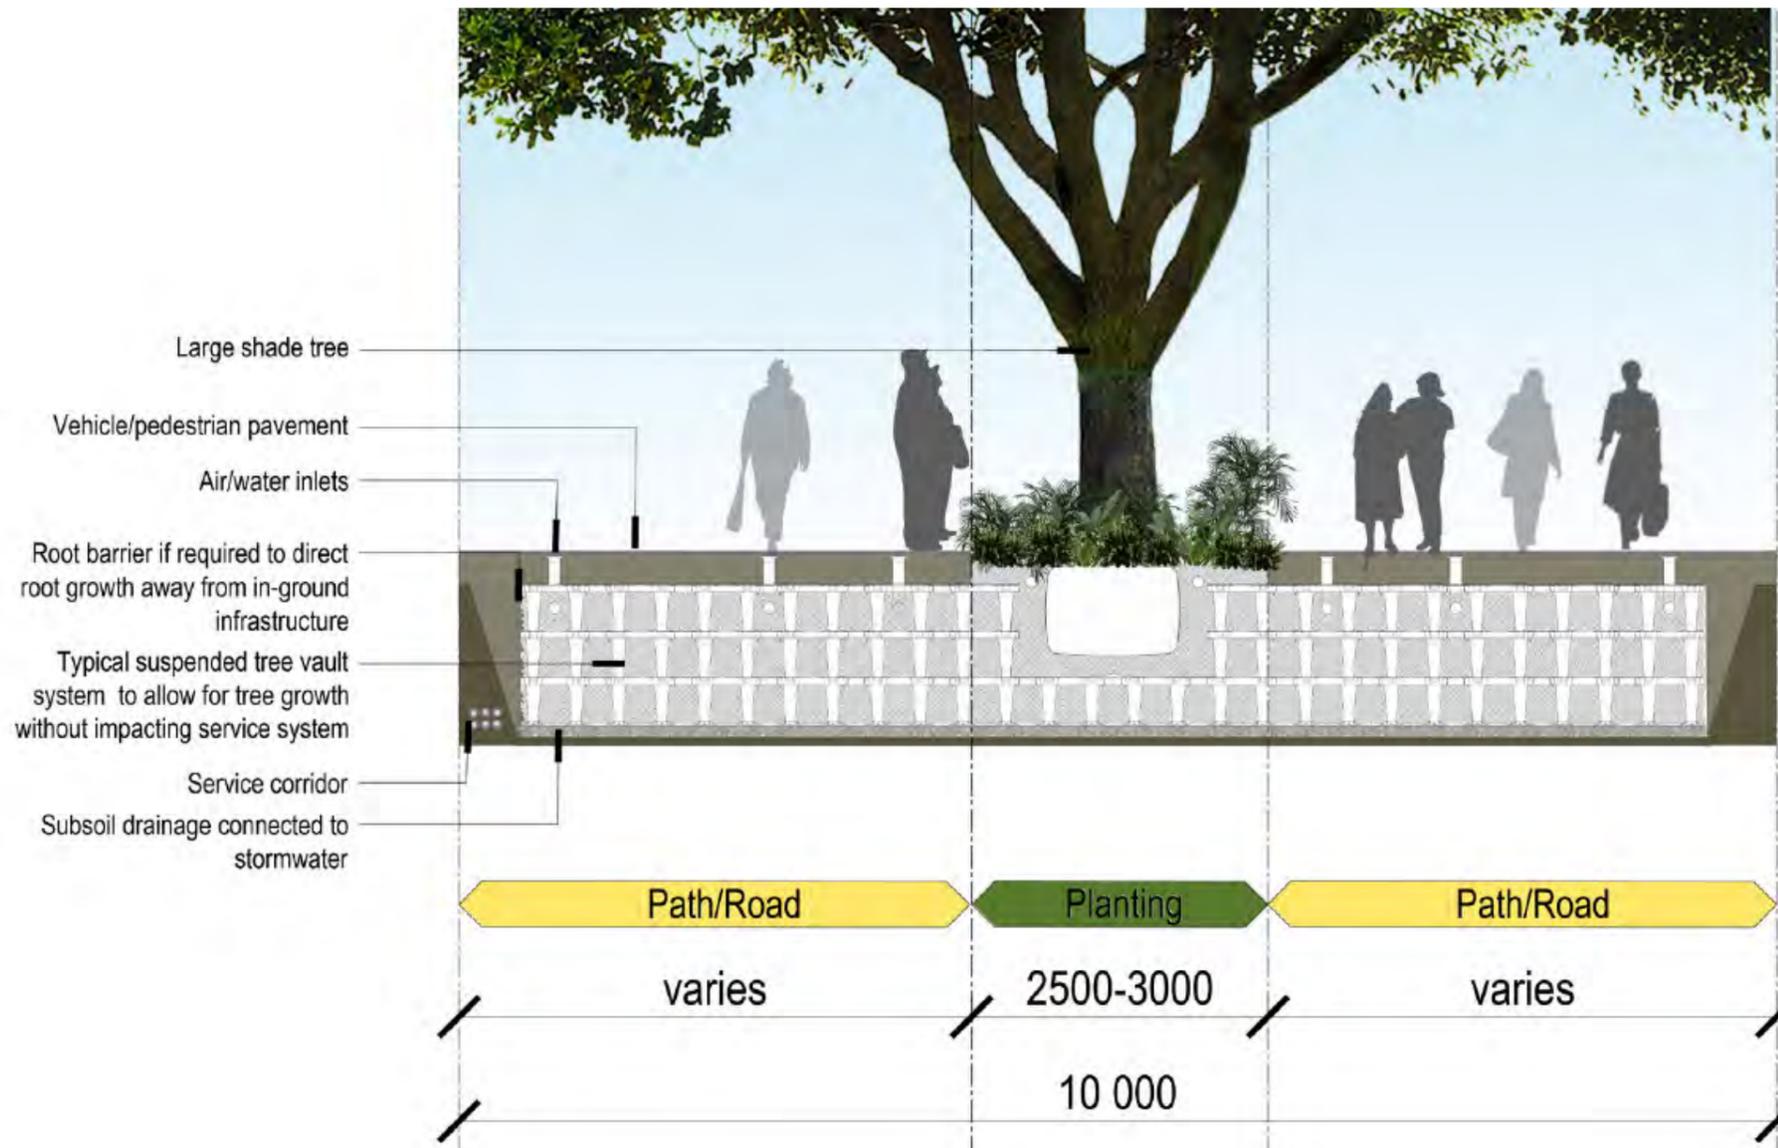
TYPICAL SECTION FOR LARGE TREE ZONE INTENT WHERE SERVICING CORRIDORS ARE NEAR-BY
